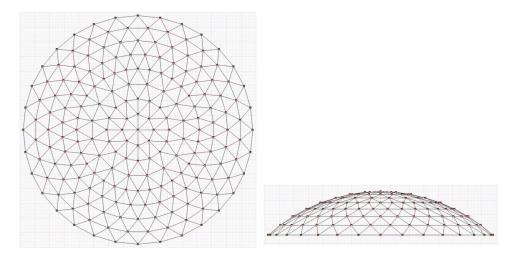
Spherical lattice dome: (a) Plan, (b) Elevation
